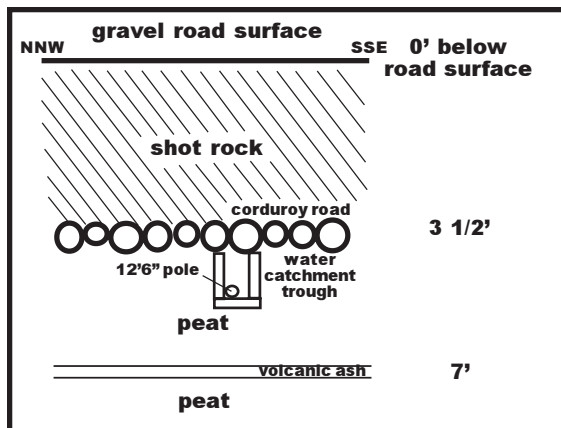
The shotrock road bed at the intersection of English Road and Alder Street was directly over the corduroy road, with the water catchment trough below.
